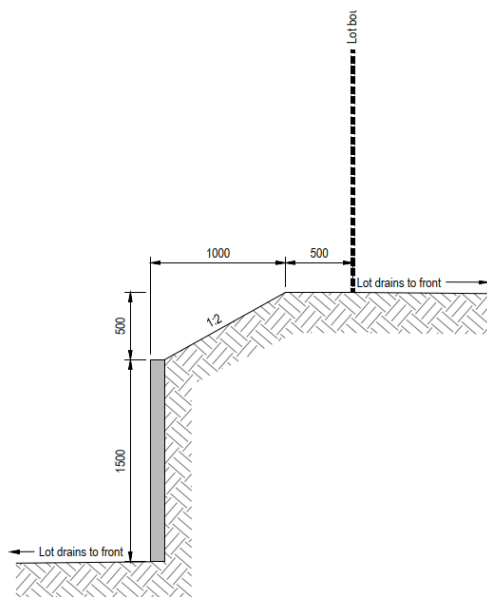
Retaining Wall Detail (maximum height) (Source: Geolink)
